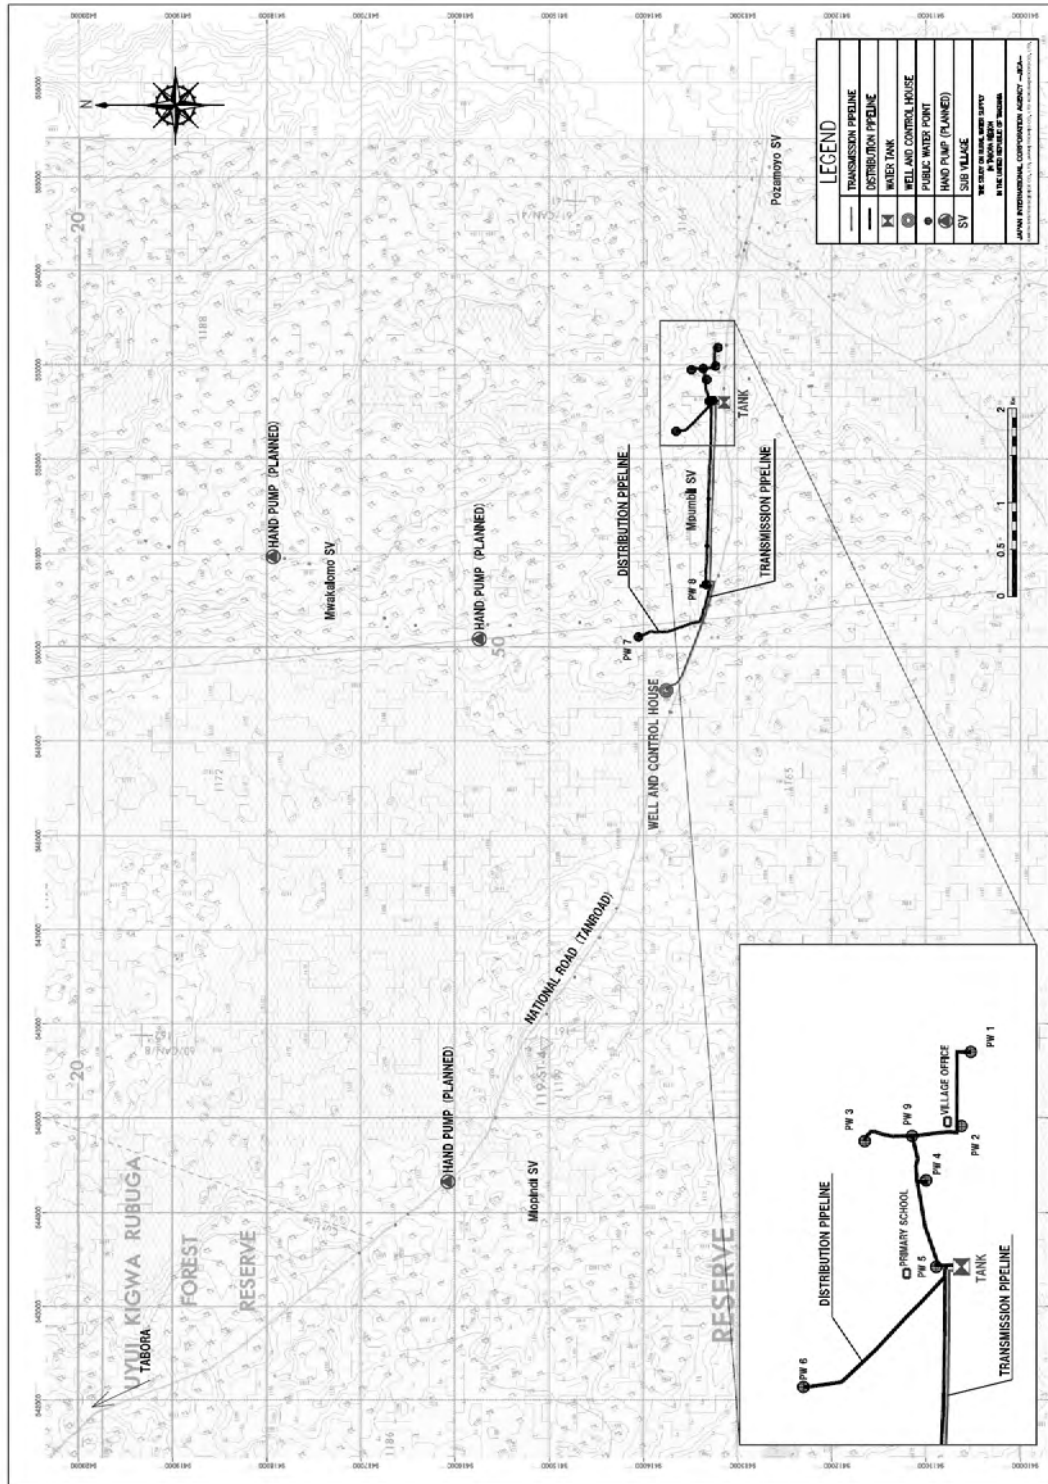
Layout Plan of Mpumbuli Village, Tabora Rural District
